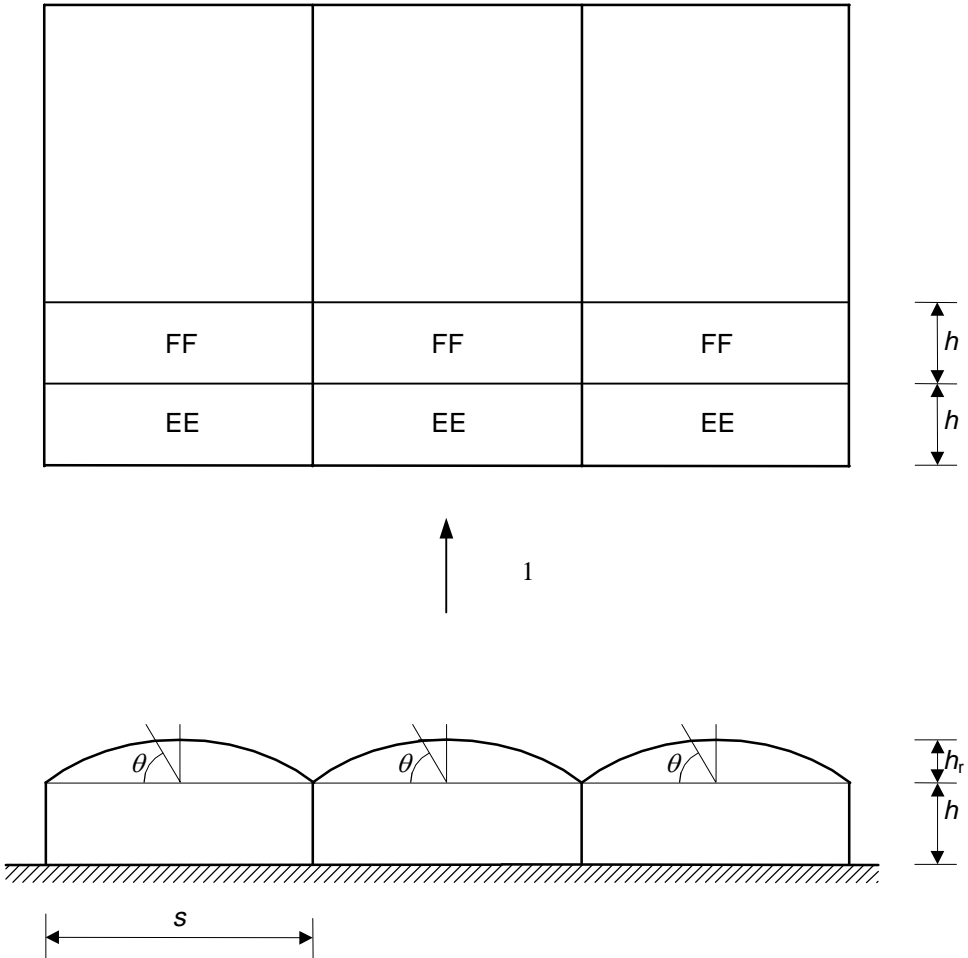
Zones for the vaulted roof of multispans greenhouses without eaves
